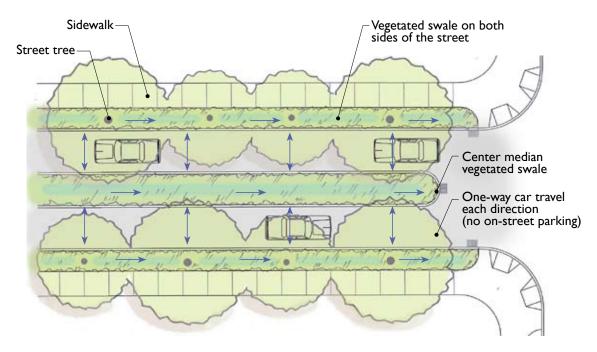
Side Swales and Median Swale (No On-Street Parking)-Plan View
